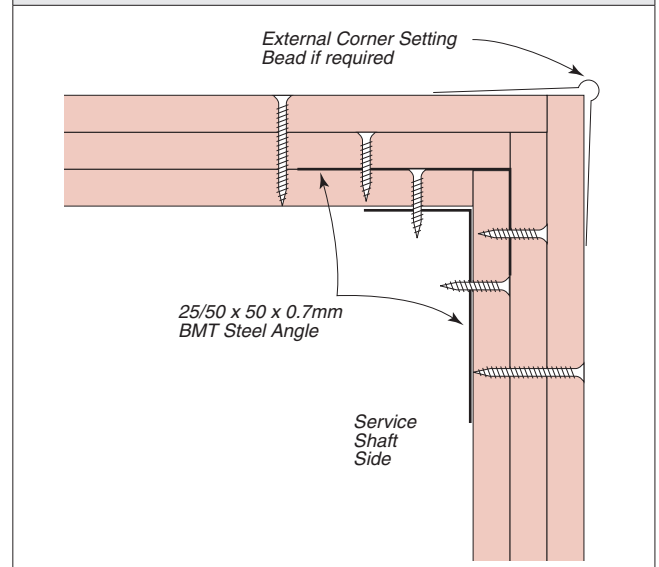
TYPICAL FIXING – SCREW AND ADHESIVE METHOD
